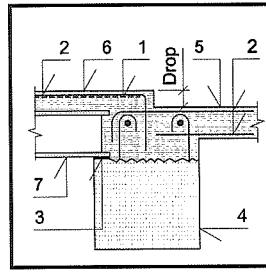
Beam/Hollow Core Slab/In-Situ Slab
